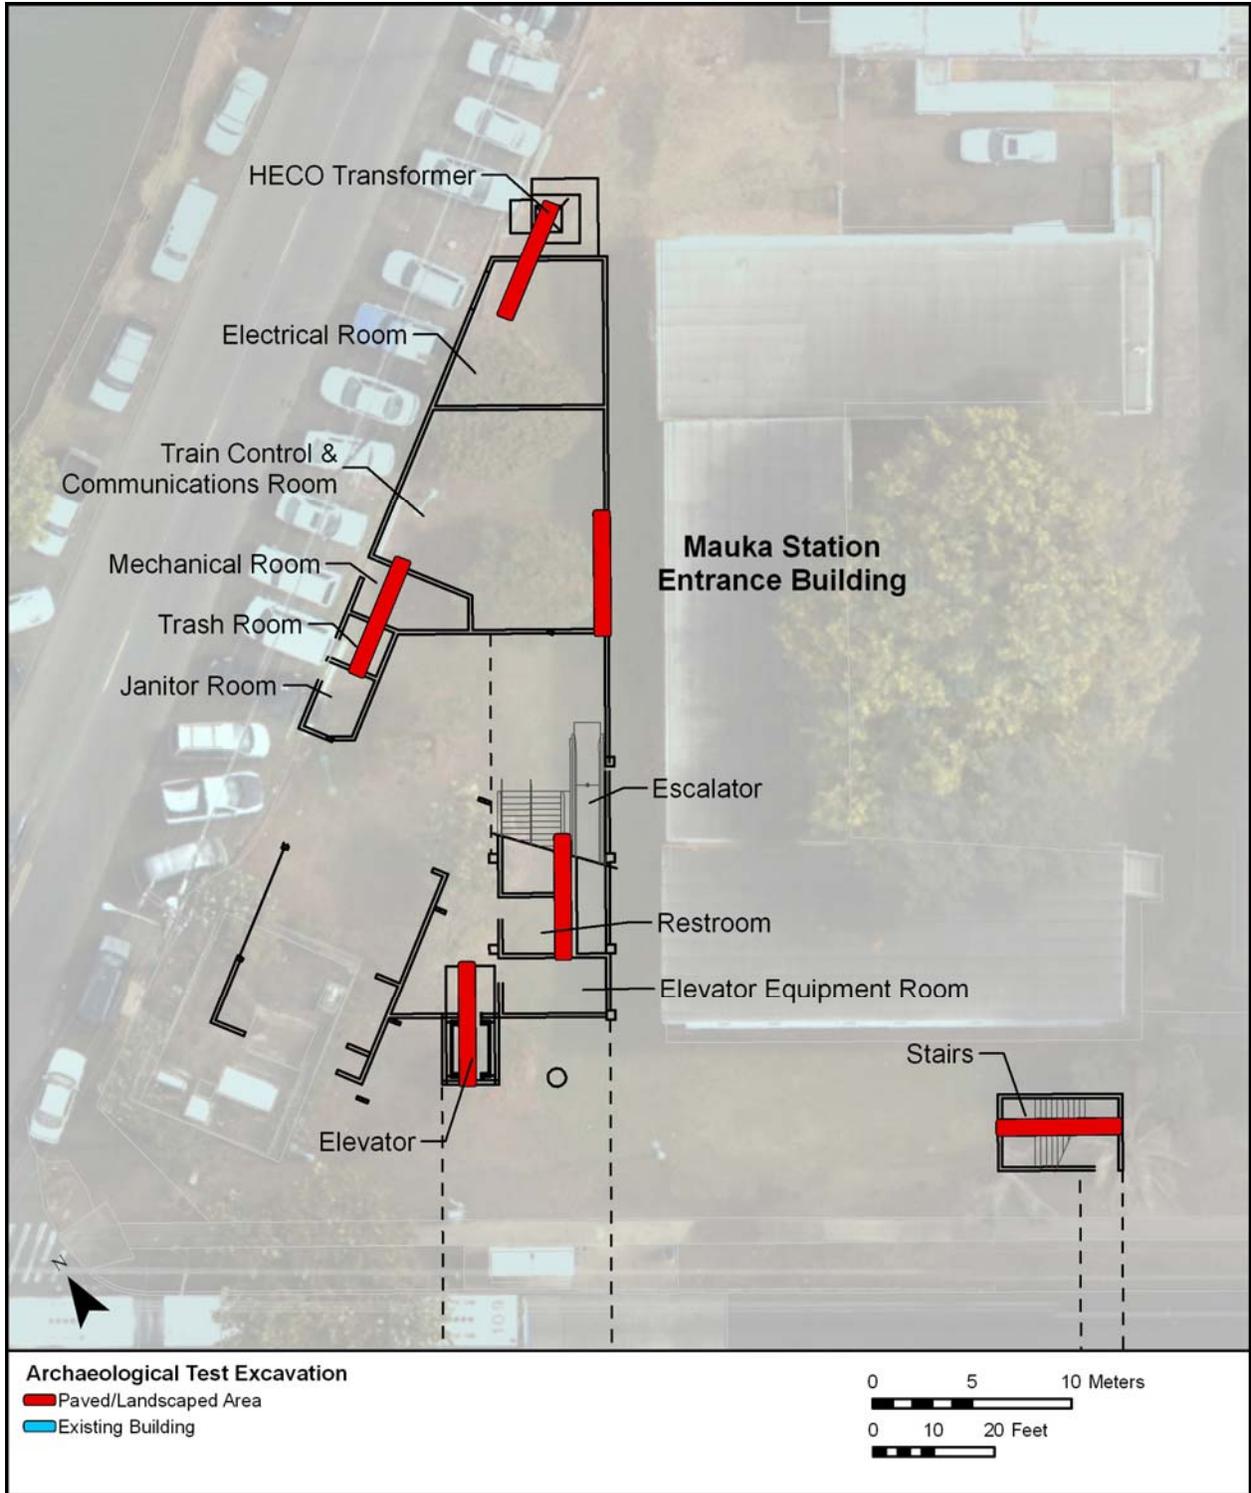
Kapālama Station, detail of (*mauka*) Station Entrance Building showing proposed locations for archaeological inventory survey testing (five 2' by 20' test trenches at *mauka* Station Entrance Building and one test trench with a 2' by 20' excavation at small eastern *mauka* touchdown)
